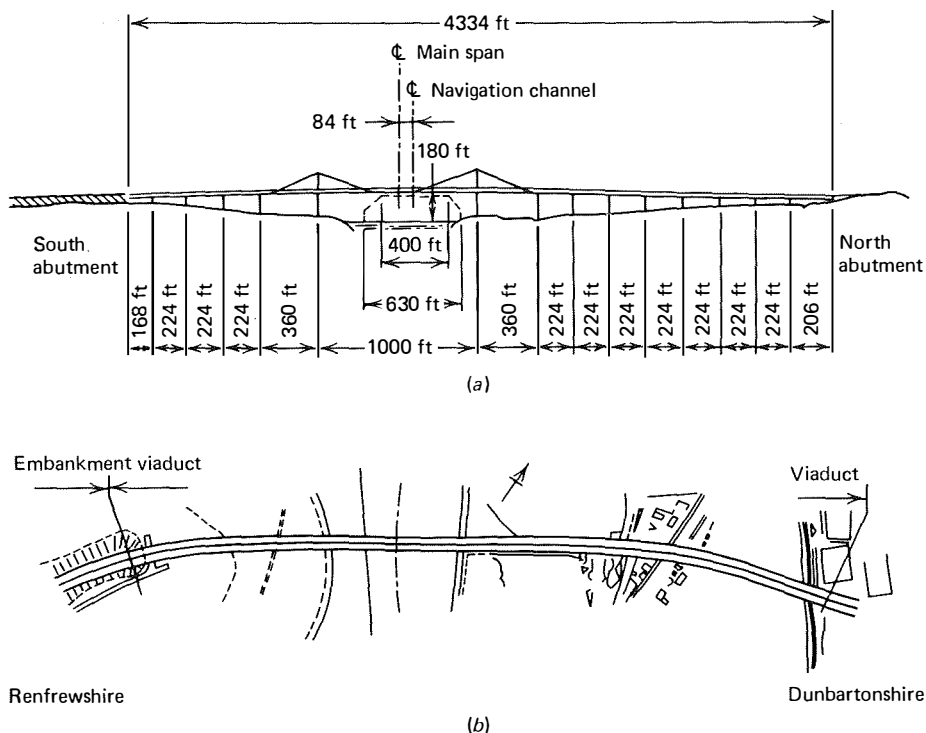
Erskine Bridge: (a) elevation and (b) plan. (Courtesy of The British Constructional Steelwork Association, Ltd., from reference 22.)
